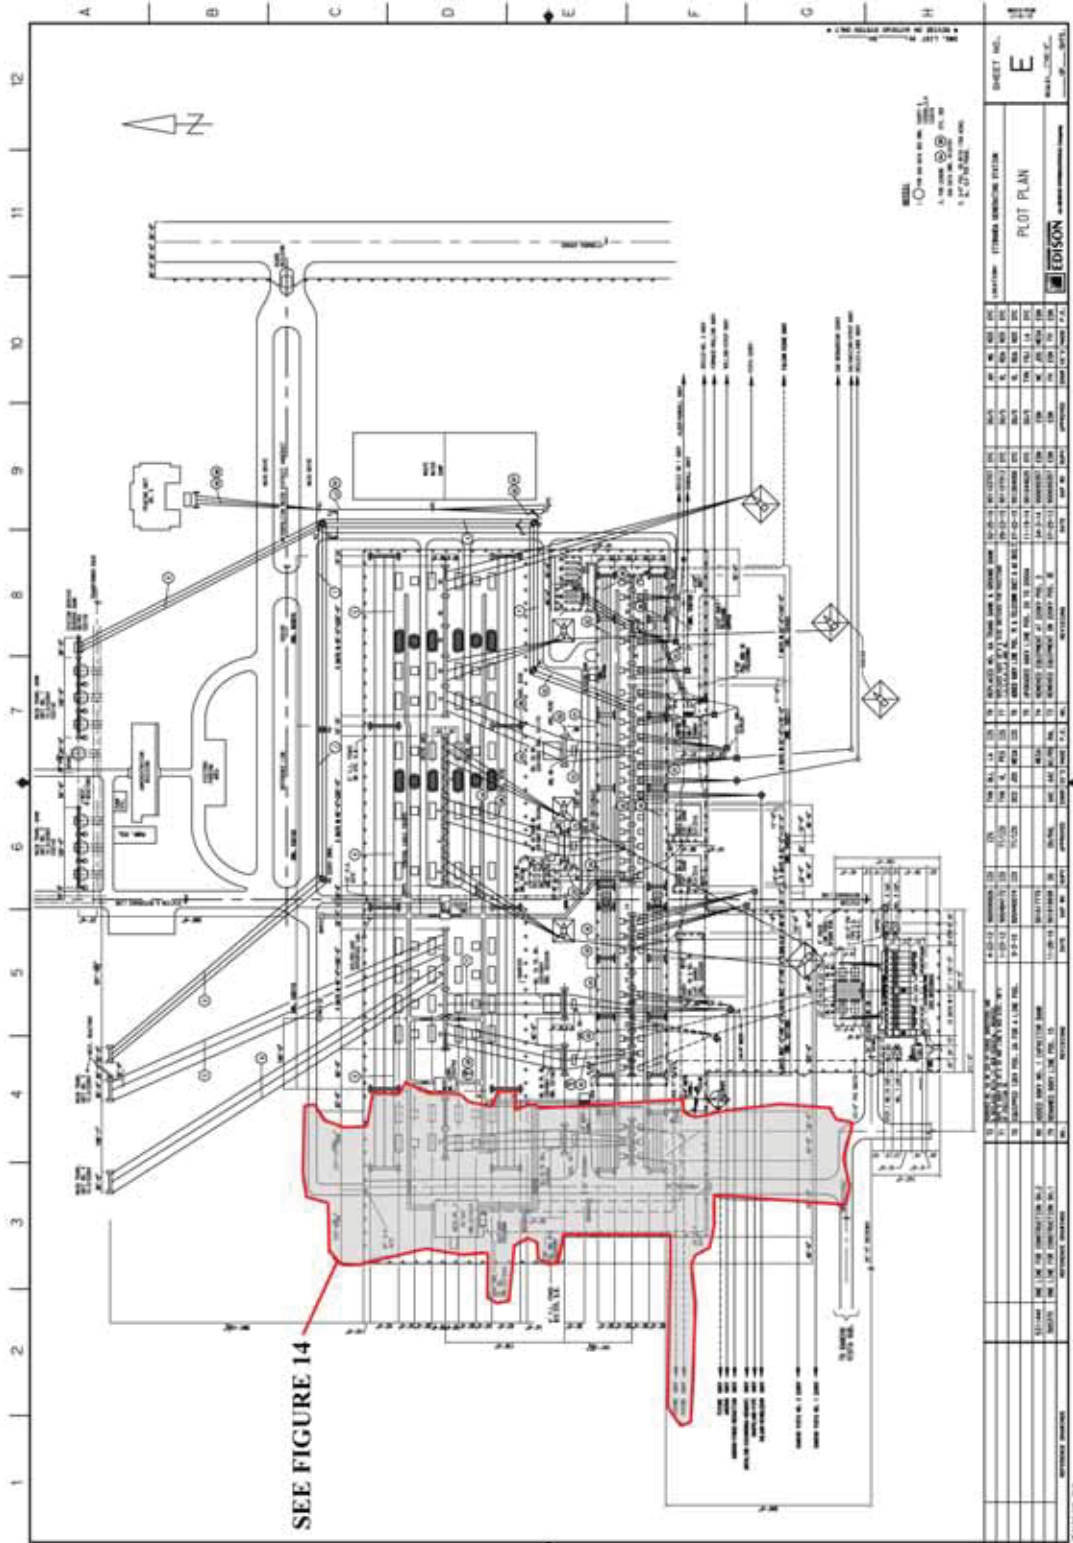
ETIWANDA SUBSTATION PLOT PLAN
